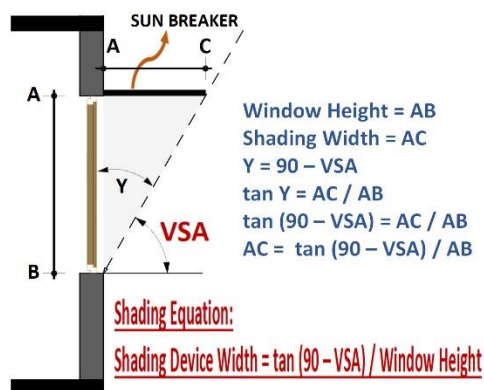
Sun breakers simple design at south elevations, Source: The author.
